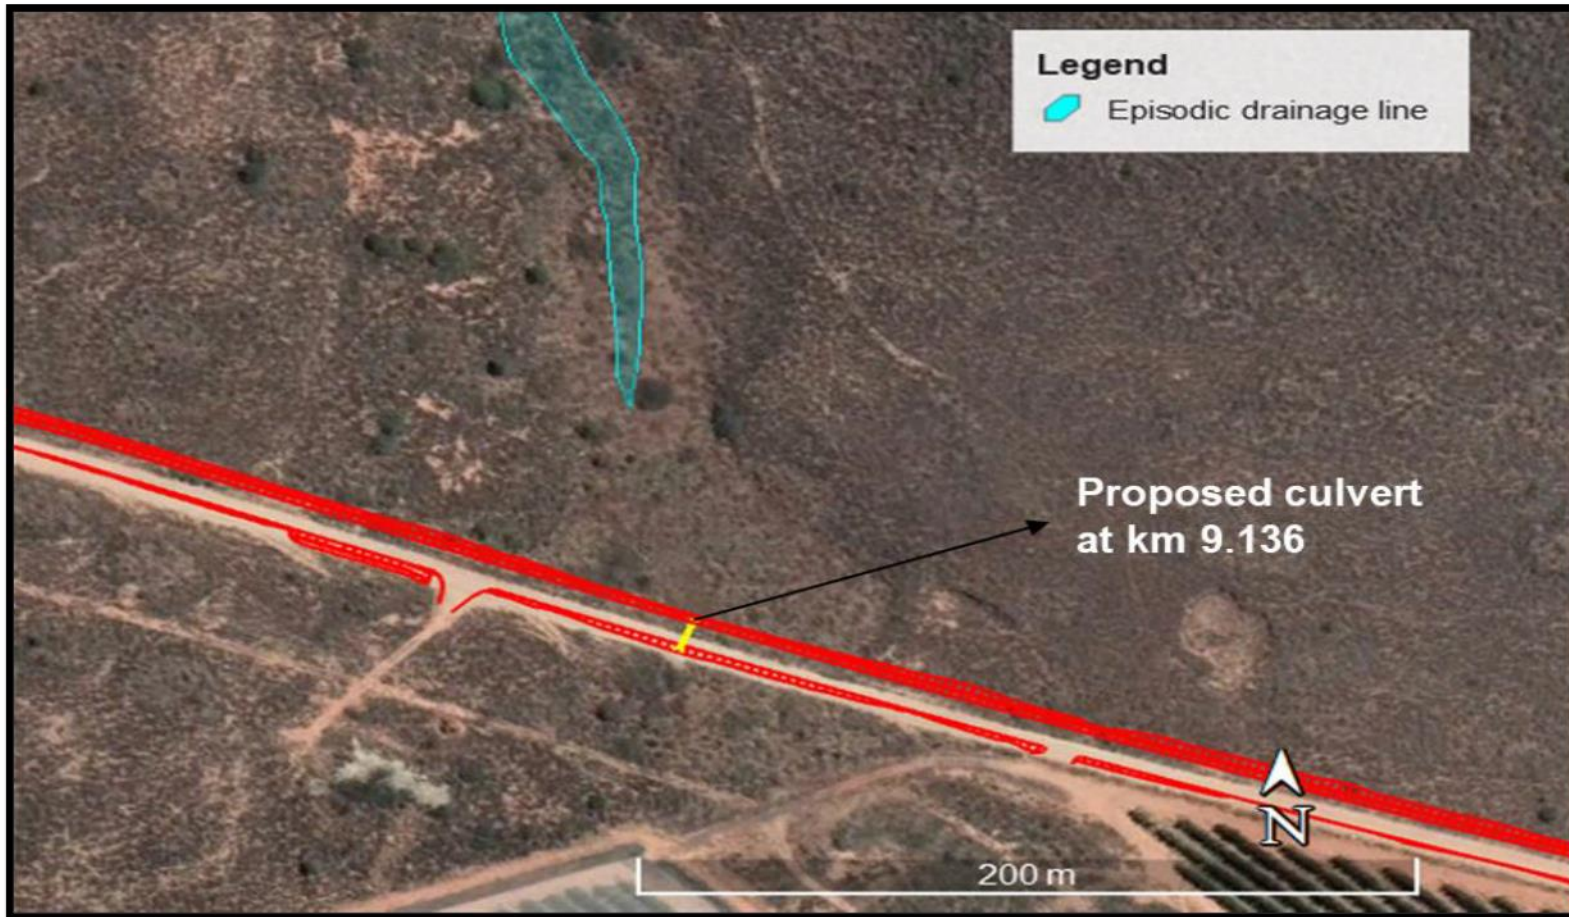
Proposed new culvert down gradient of the non-perennial drainage line at Km 9.136.
